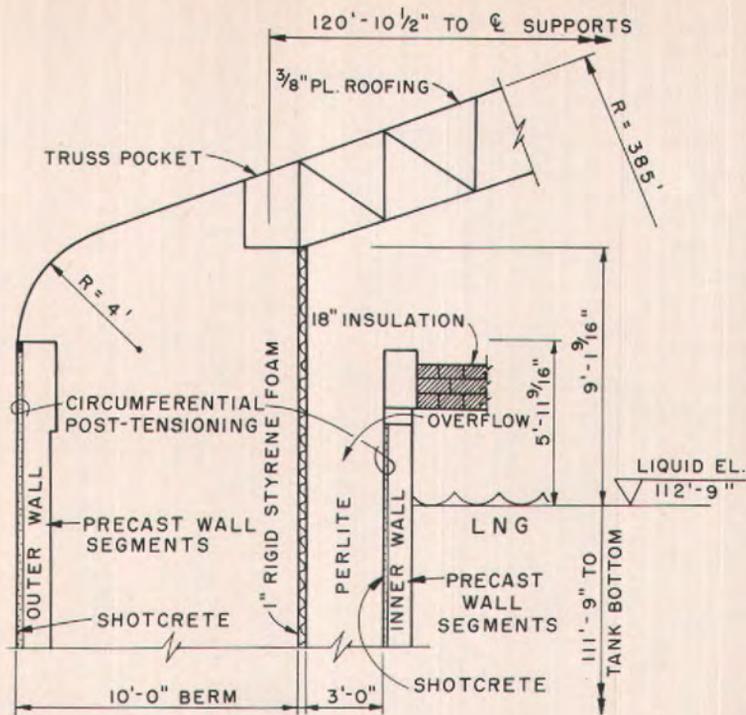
Section of double wall with post-tensioned precast wall segments.
